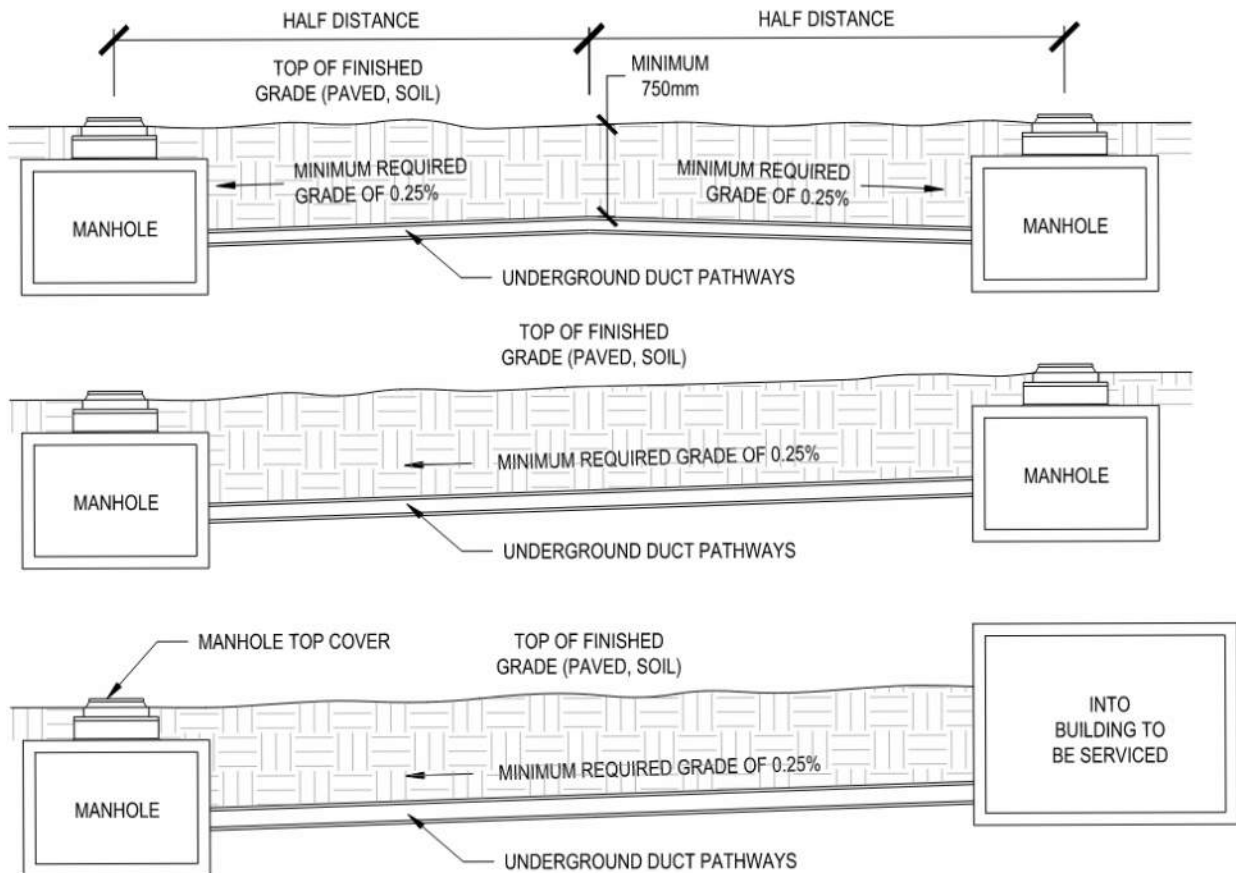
Underground Duct Pathway Routing Typical (Attain Drawing Page #9)
